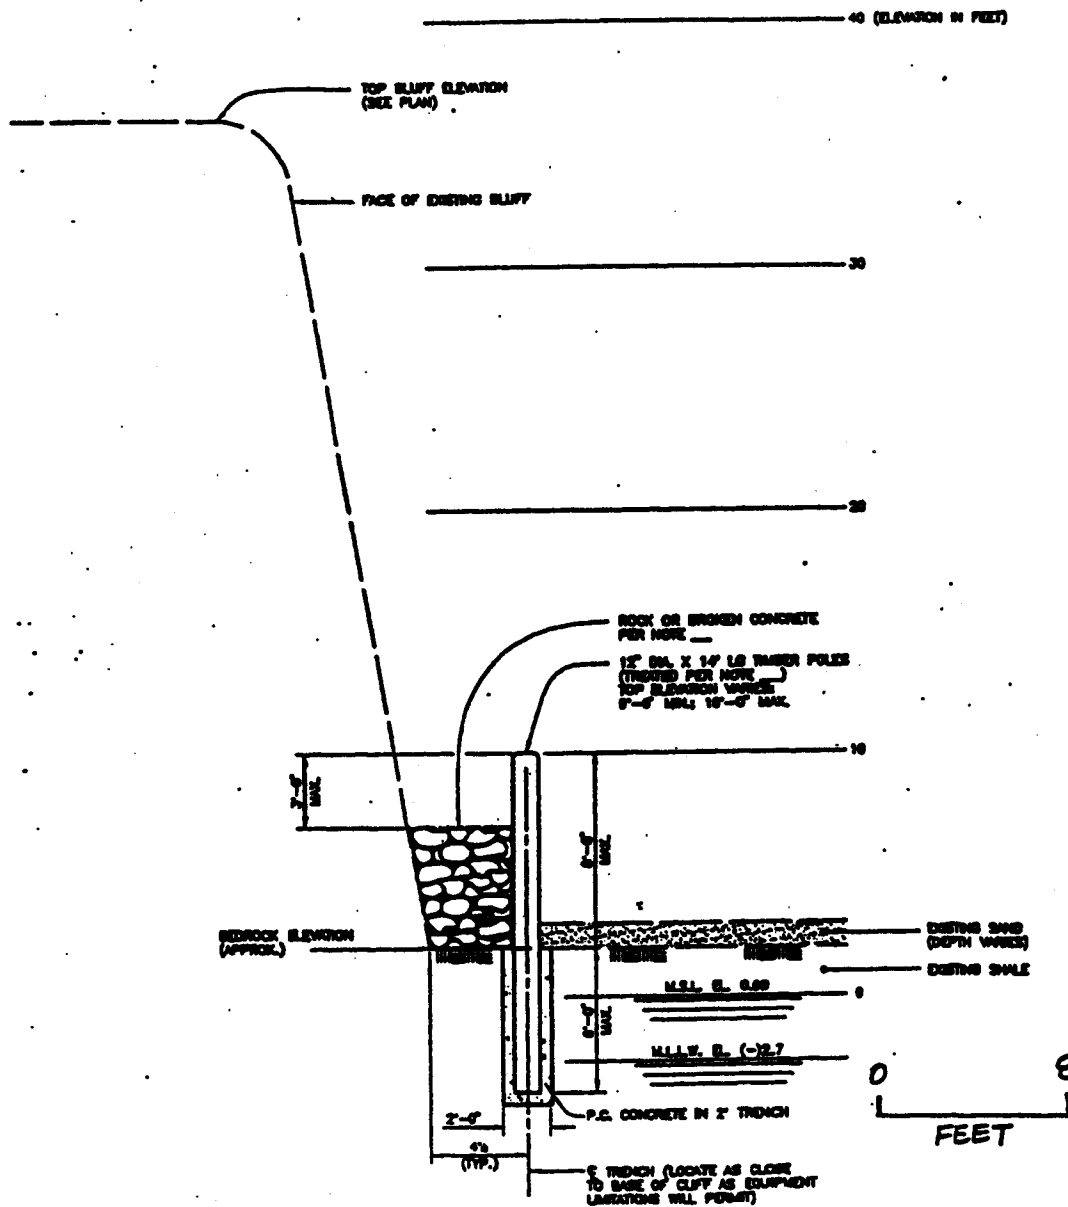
Cross-sections illustrating the design of the proposed timber seawall.
